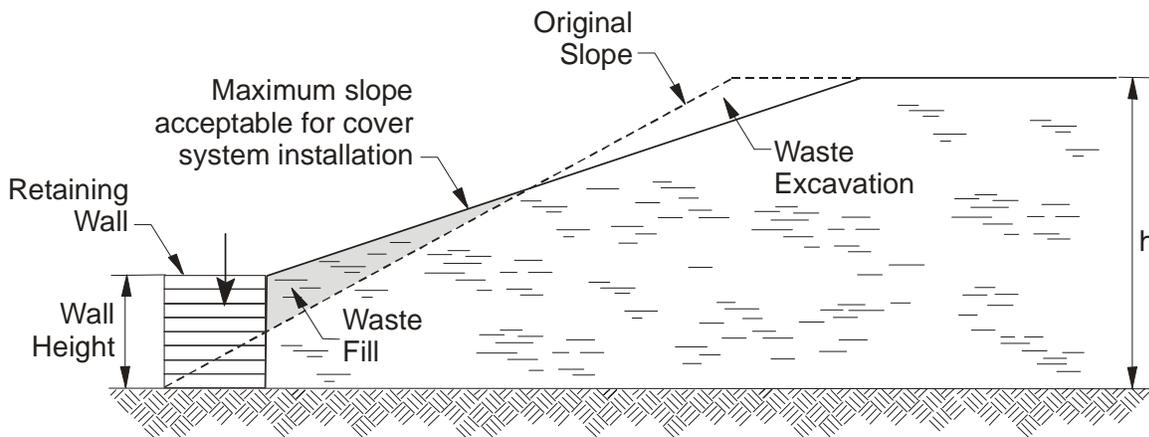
Buttress Approach for Constructing Cover Systems Over Steep Waste Slopes Without the Need for Significant Waste Excavation.
